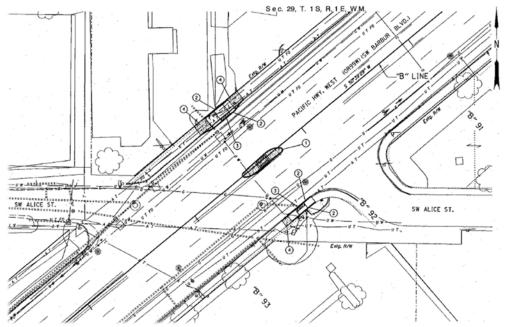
Plans for RRFB at intersection of SW Alice Street
